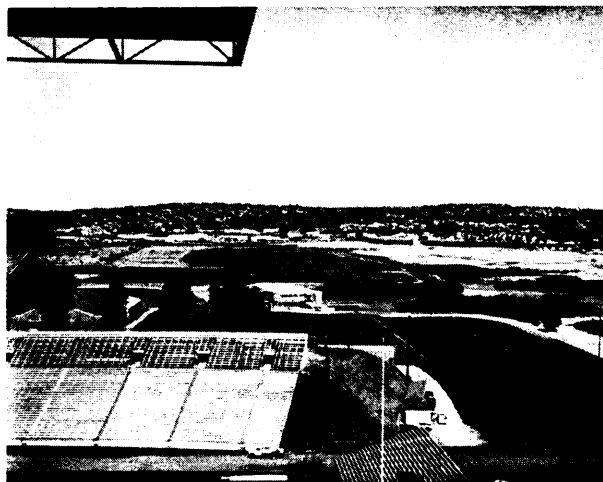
AREA RECLAIMED FROM UNION BAY, 1965
